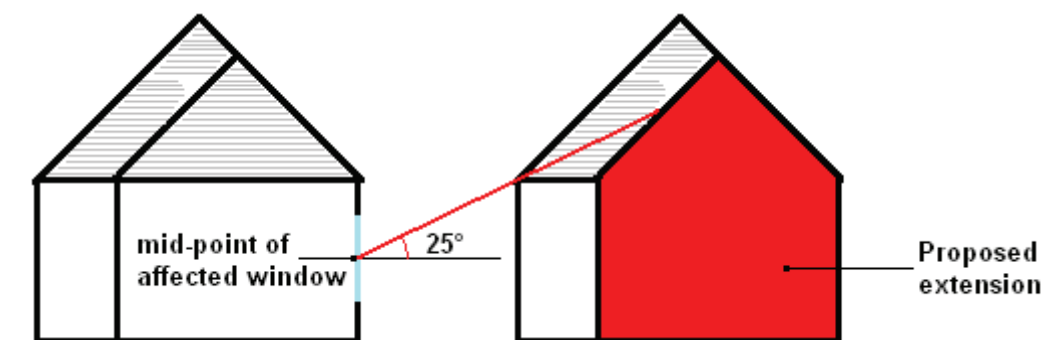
Fig A: Proposed extension may result in loss of daylight to adjacent window of a habitable room
